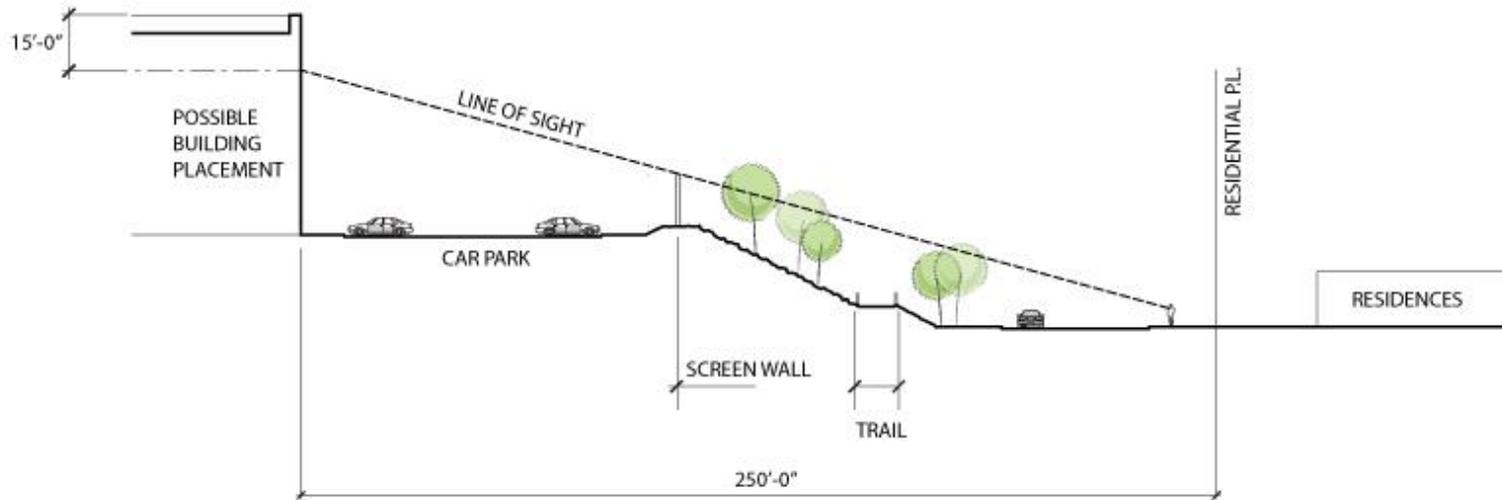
, 4-12 Merwin Street Section E and Plan View E
